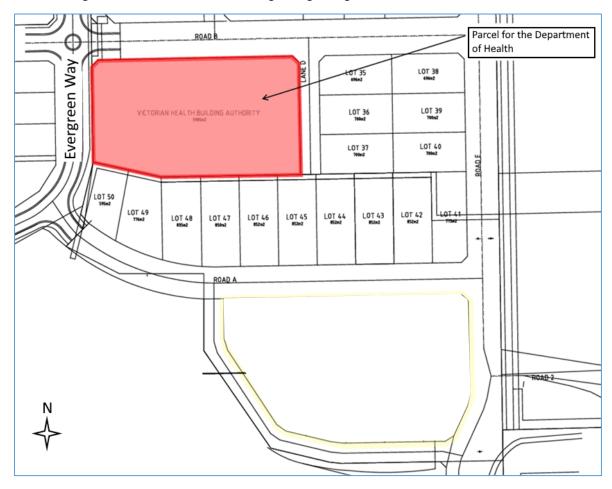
Parkside Drive, Shepparton, proposed Early Parenting Centre site.
